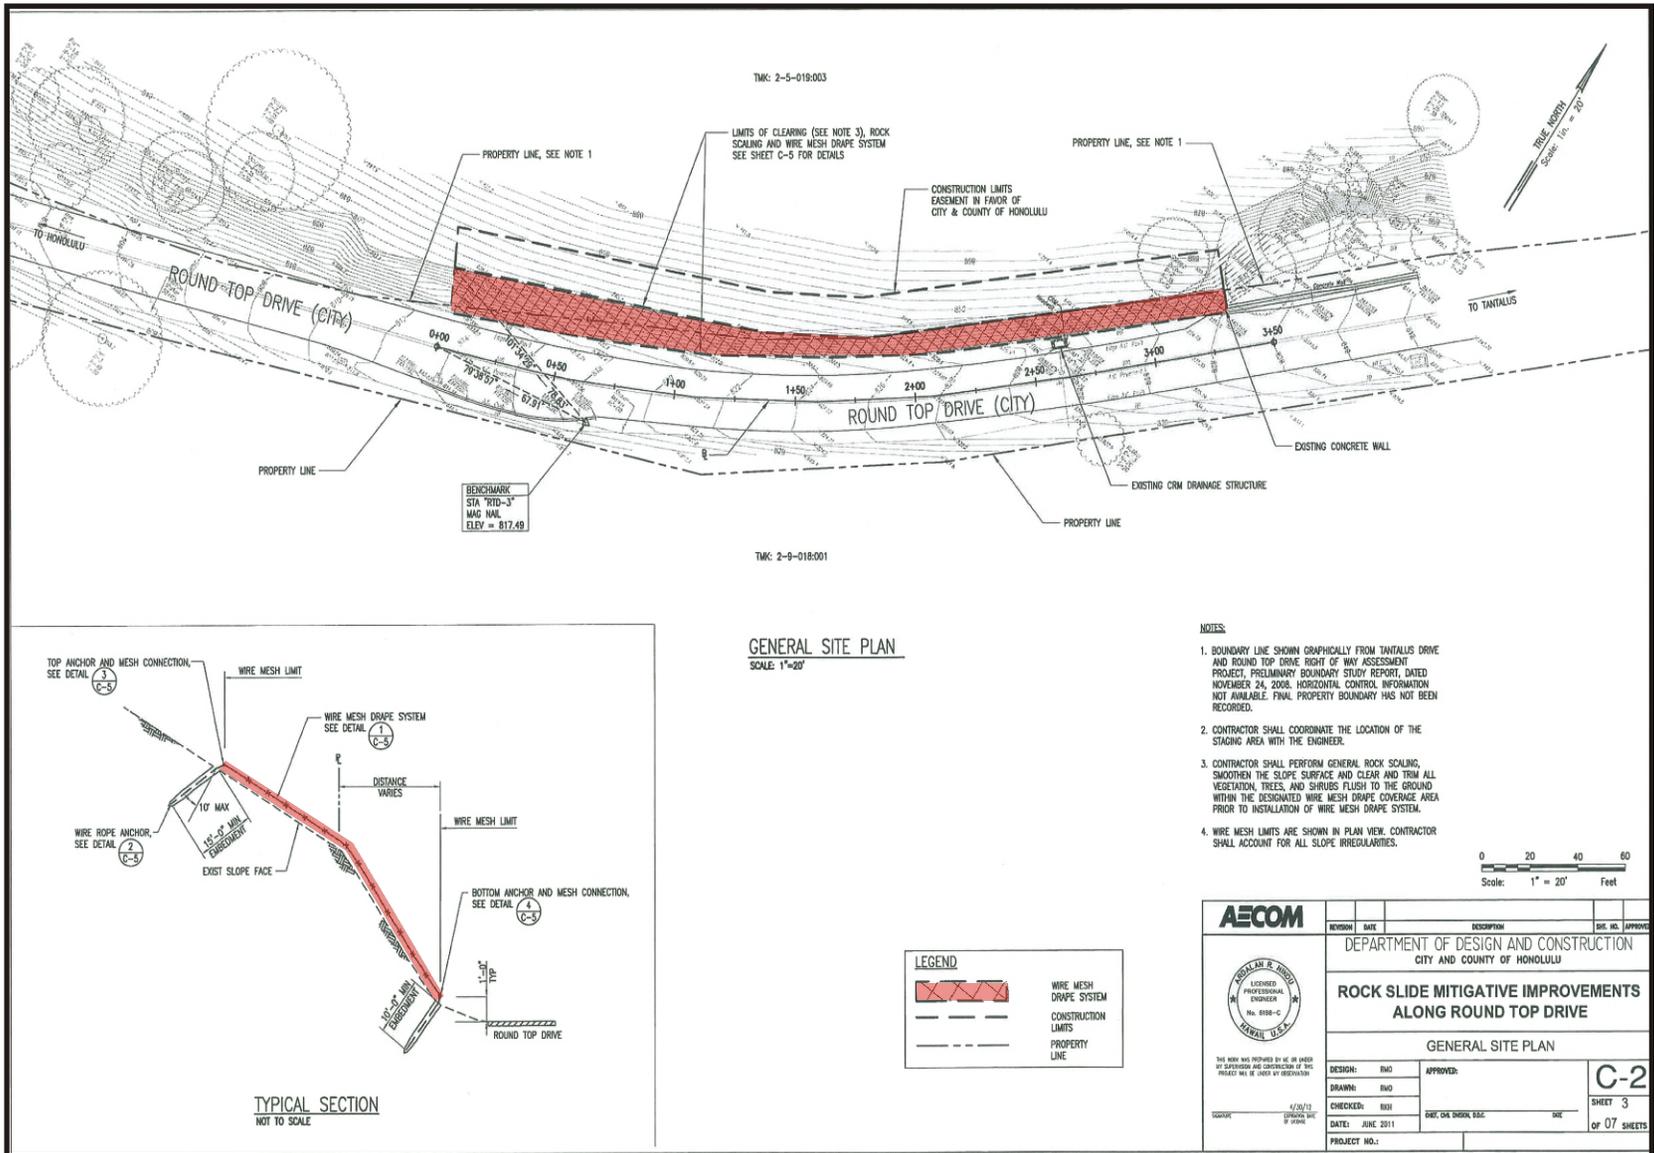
Site Plan Showing Location of Proposed Rockfall Mitigation Activities.
